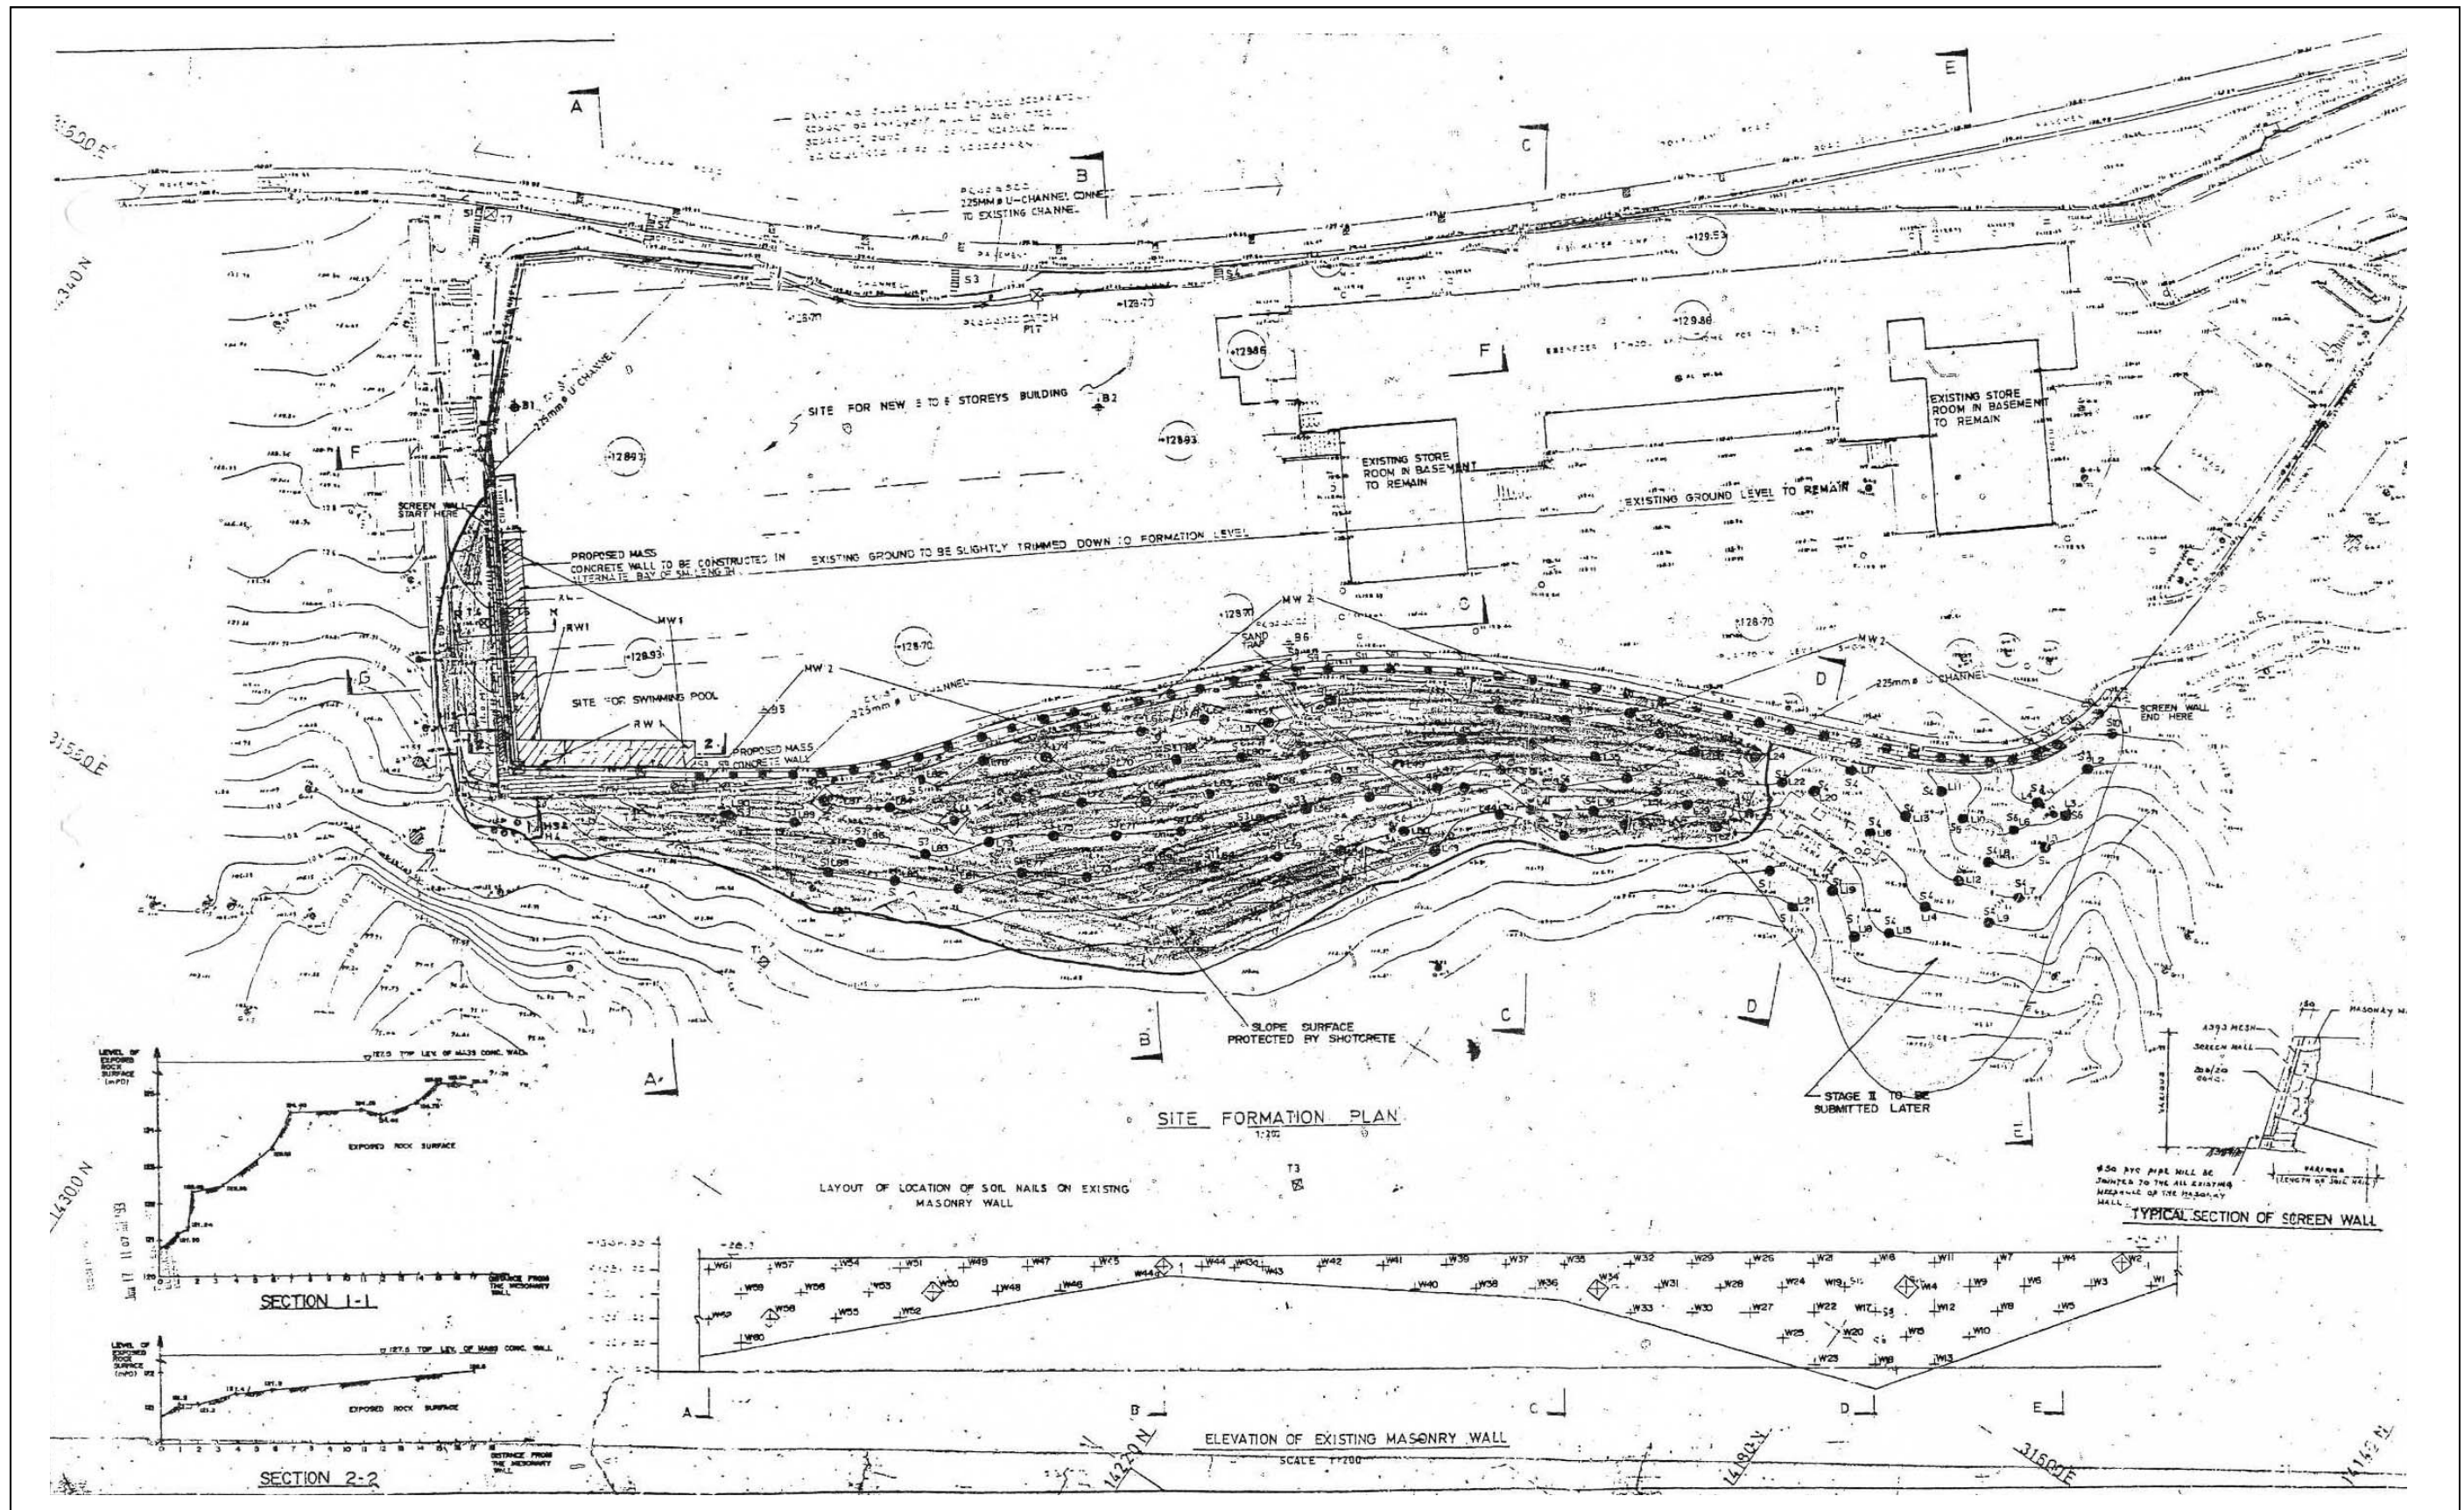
As-constructed Soil Nail Arrangement (Extracted from Record Plan No. FSF02 dated 17 June 1993)
